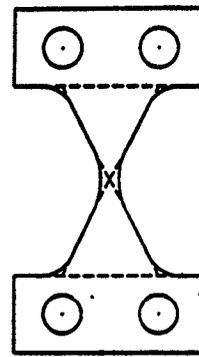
ADAS X shaped steel plate and installation details (from Whittaker, 1990).
